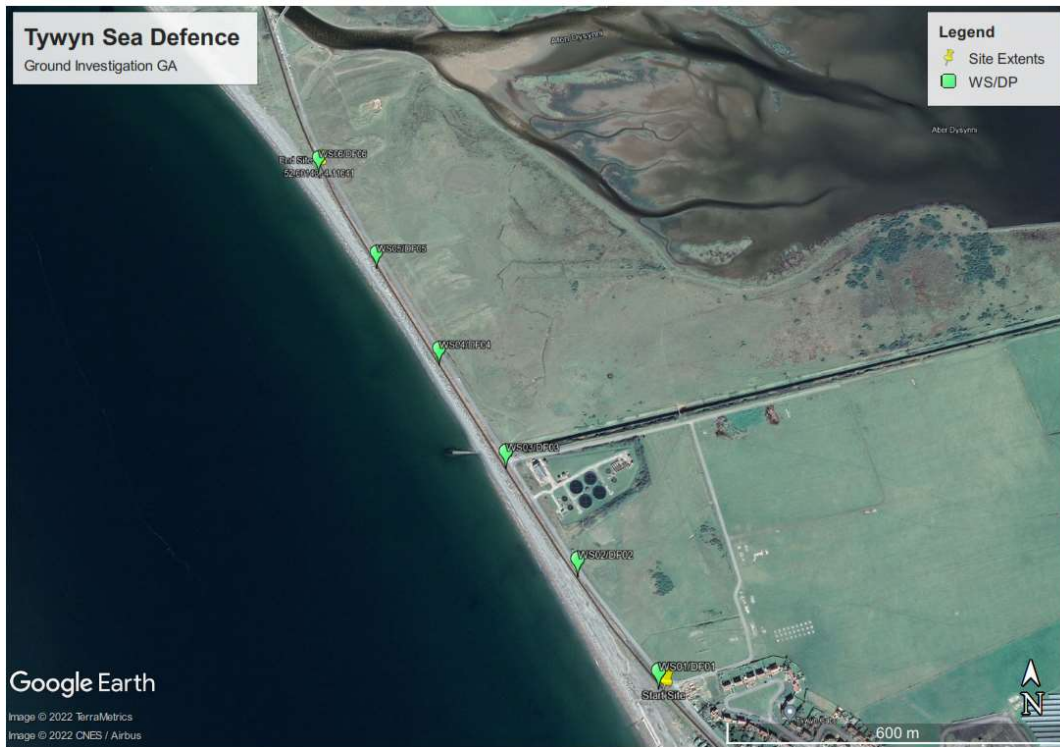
Tywyn Sea Defence. Proposed GI works location plan.
